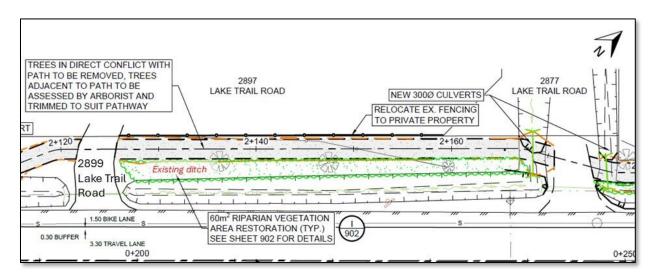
Proposed culvert installations on either side of the driveway at 2877 Lake Trail Road and required vegetation clearing between 2899 and 2877 Lake Trail Road.
